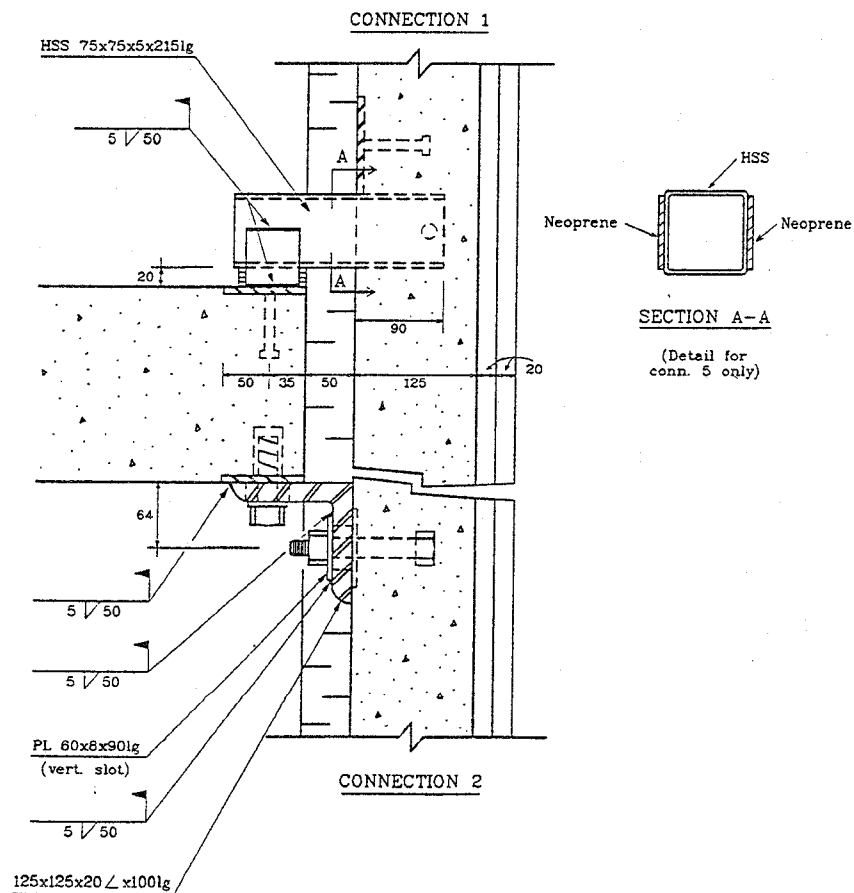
Details of typical connections (from Smith and Gaiotti [1989]).
